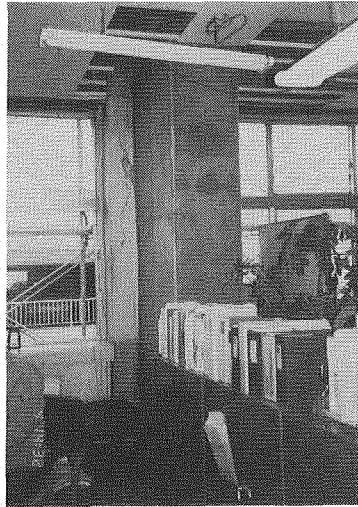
Added R/C column to support the failed column shown in Photo. 7.
